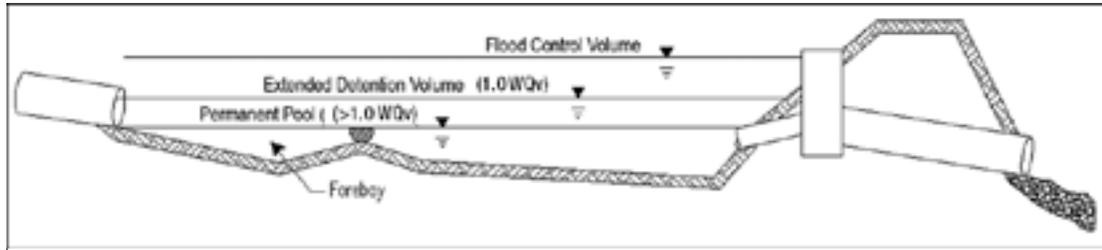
Wet Storm Water Pond with Extended Detention and Flood Control Volumes
